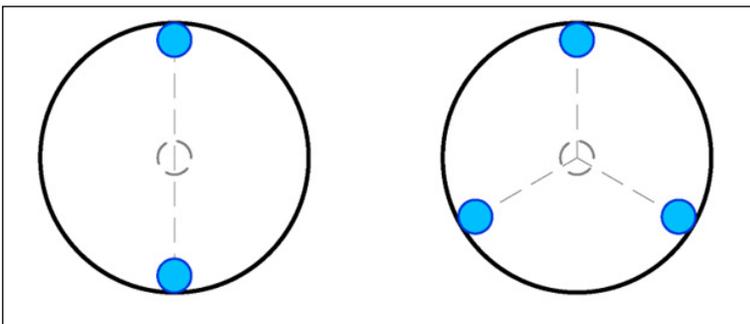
Typical arrangement of opposed pair and triplet strain gages in pile cross section with computed average (dashed lines)
